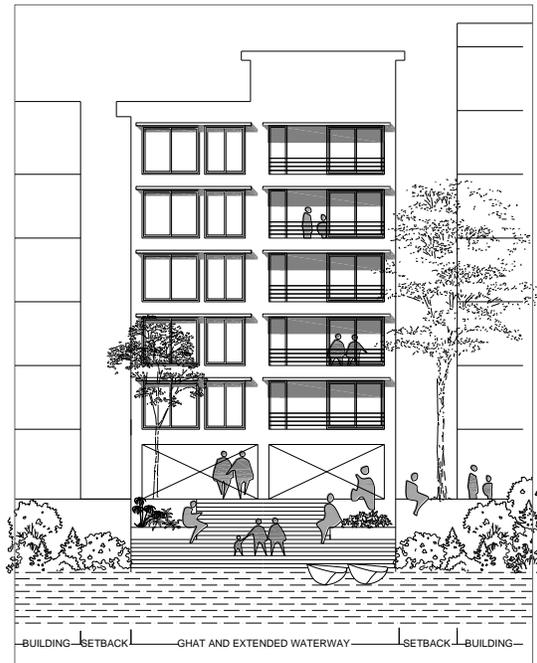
Proposed typical building opening pattern and verandah, and hat toward waterfront
